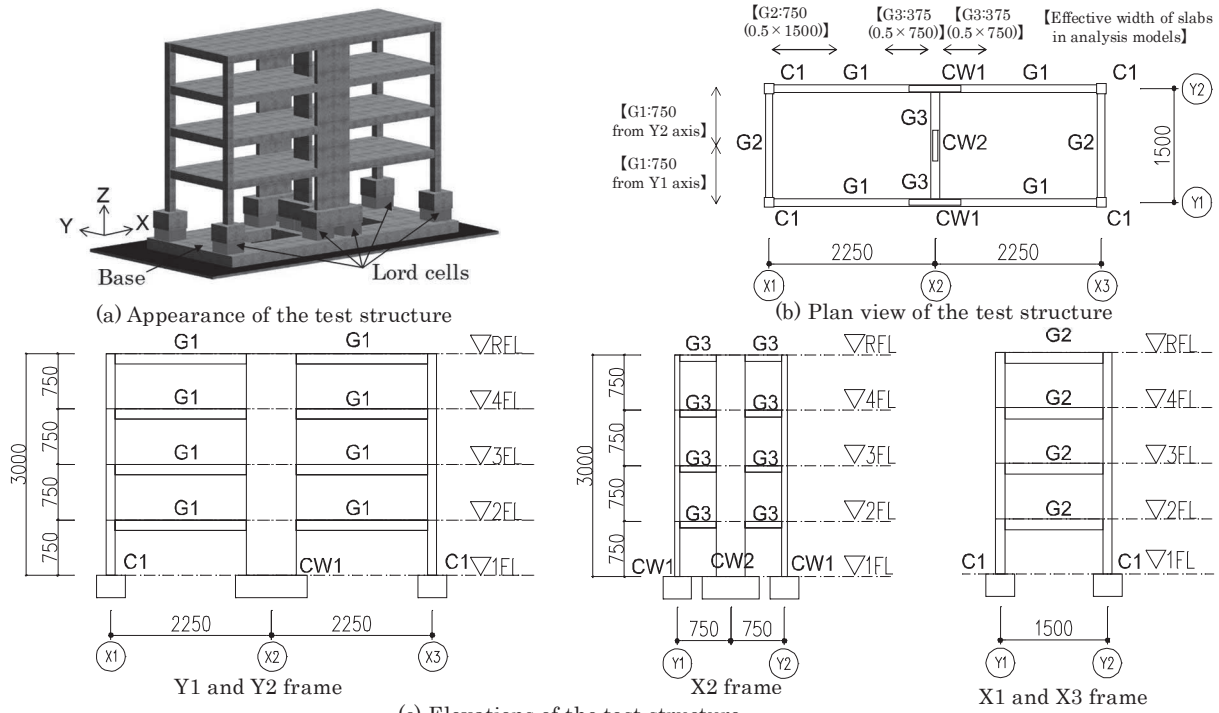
(a) General view; (b) plan view; (c) X- and Y-direction elevations of the test structure
